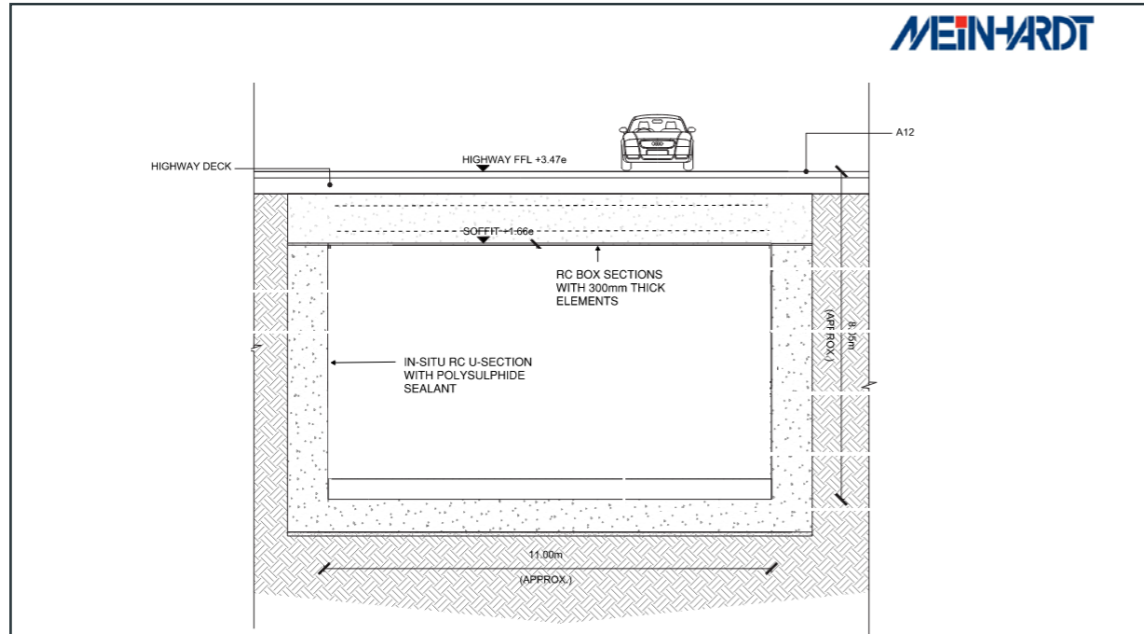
Sketch showing interpreted existing underpass and bridge deck structure
